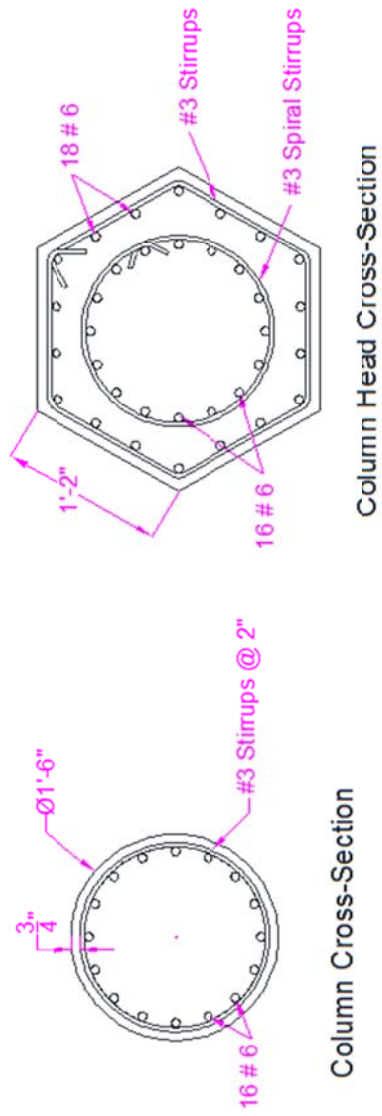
Details of longitudinal and transverse reinforcement for the specimens column and cap beam sections
